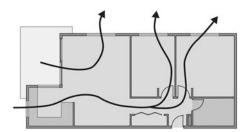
effective layout for an upper level corner dwelling/apartment.
